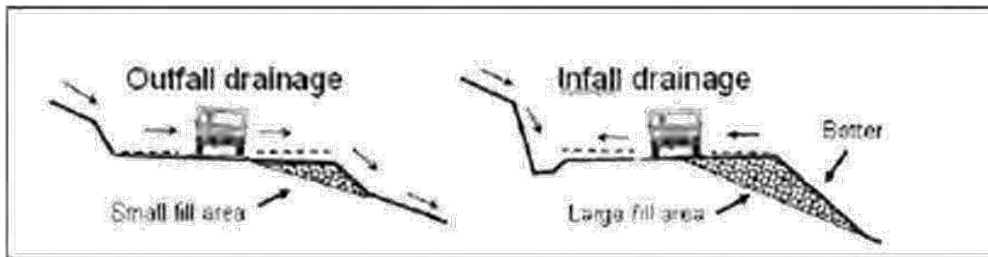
Outfall Drainage and In Fall Drainage – Steep Slope – Cross-Section
